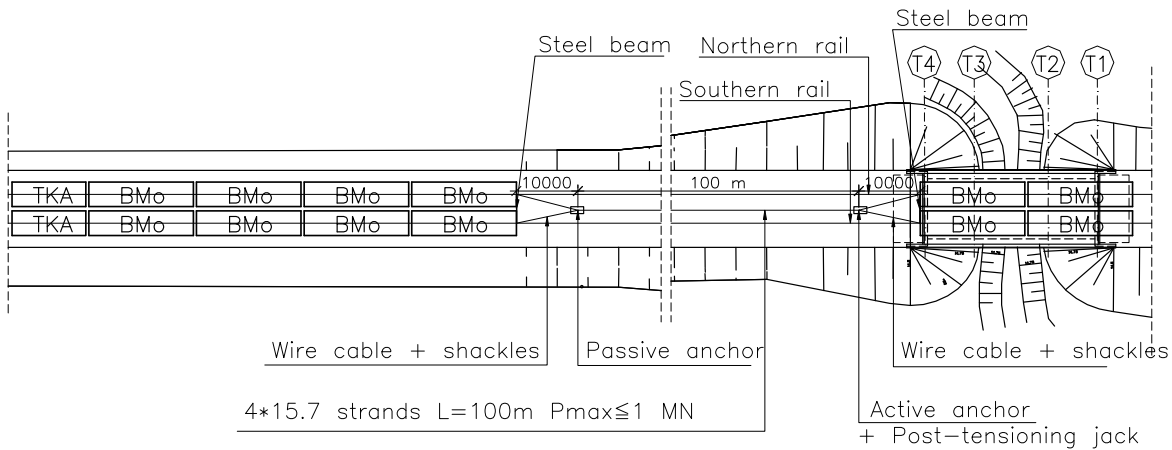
Load arrangement plan at Tekemäjärvenoja Bridge. Bmo = Railway gravel waggon, Tka = Railway engine.
